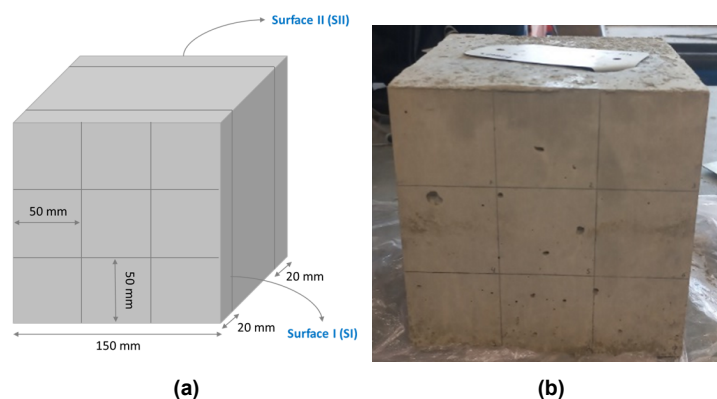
Guidelines for cutting concrete cube (a) Schematic concrete cube, (b) Real cube
